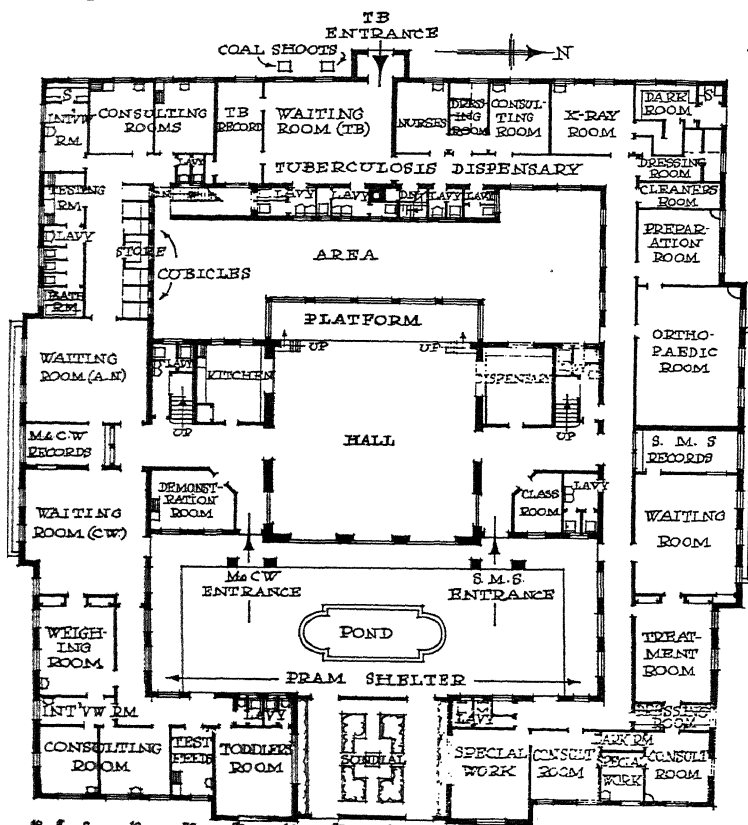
A. Model Health Clinic. (Ground floor plan.)
